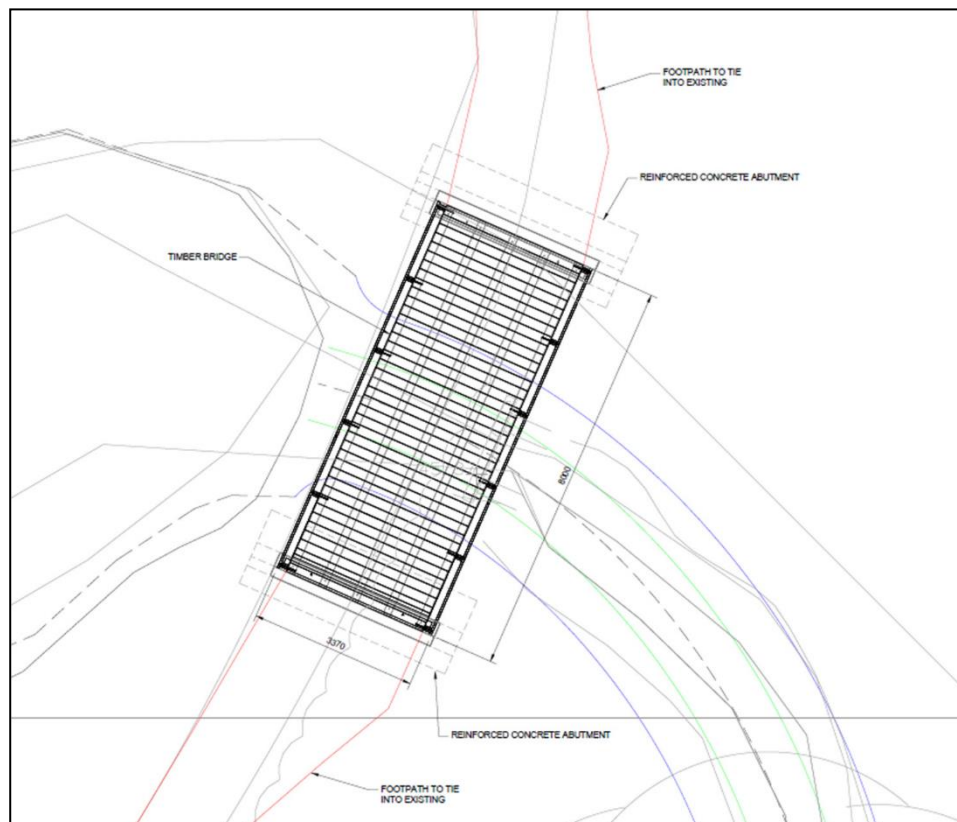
Plan view of the northern bridge (extract from drawing A119099-TGEE-ZZ-XX-DR-C-0011)
